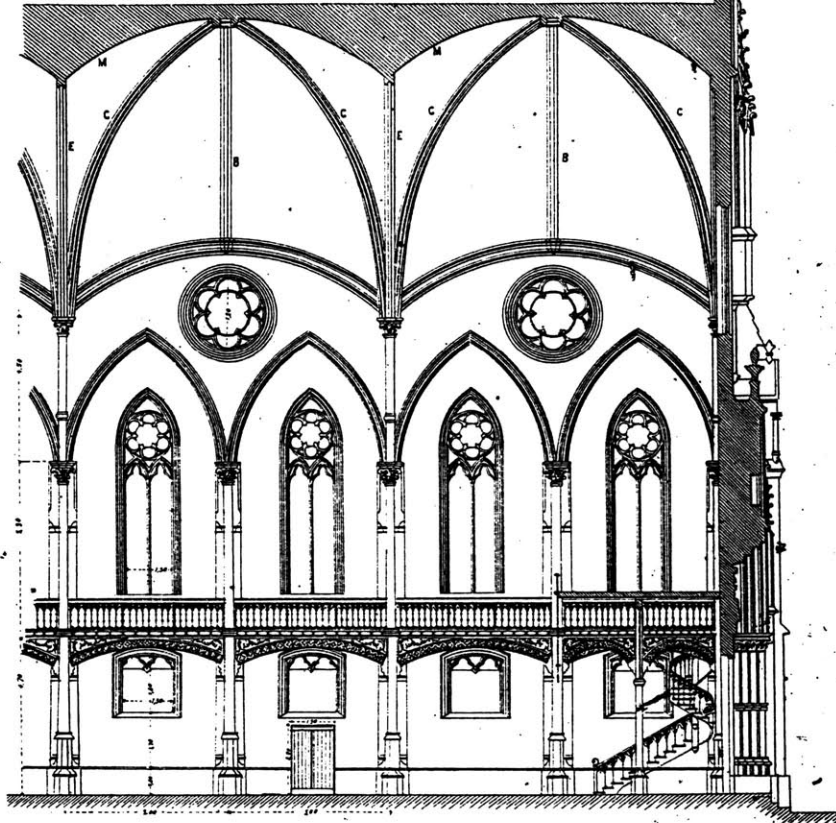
Boileau, church of St.-Eugène, 1855, iron structure, from Nouvelles Annales de la Construction (1856)
